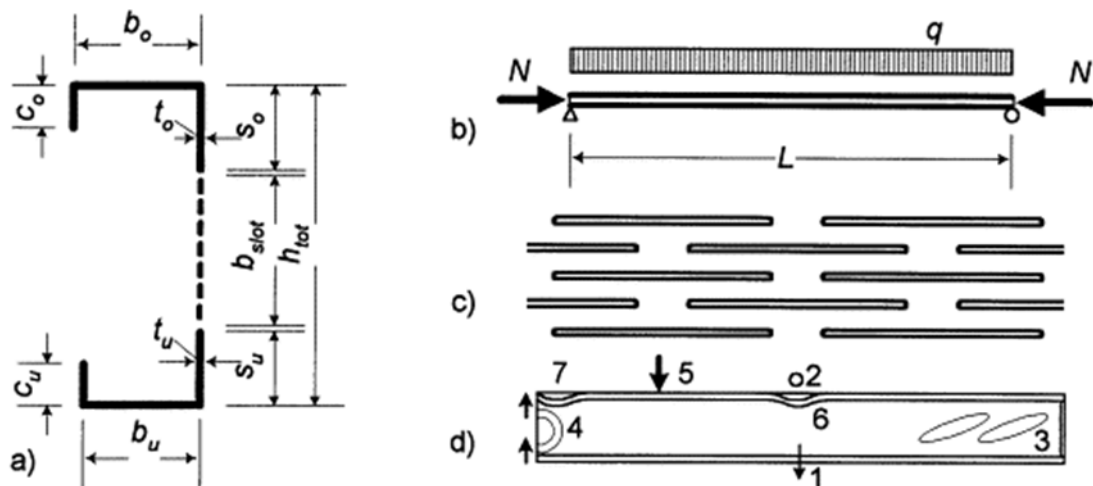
23. Slitted stud. a) cross section, b) loading, c) slits, d) failure modes [1].
